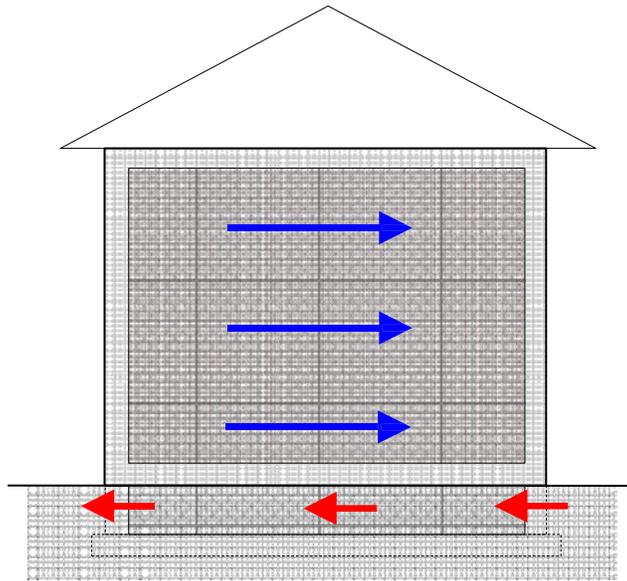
Shear transfer from confined masonry walls to foundation (capacity is based upon a combination of shear resistance of reinforced concrete tie columns and shear resistance of unreinforced masonry wall)
